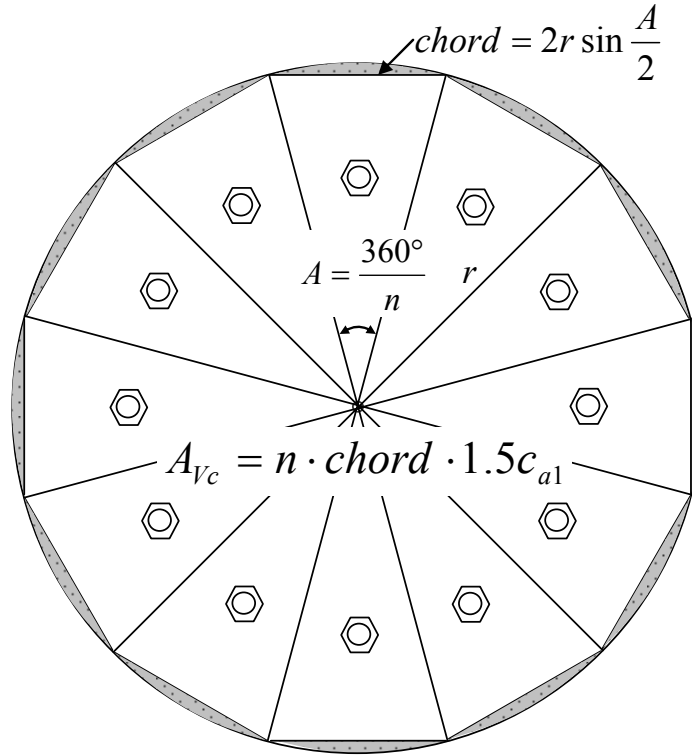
Development of the projected failure area for the group of anchors around a circular foundation
